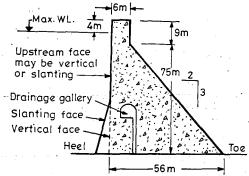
A typical cross-section of a concrete gravity dam.
